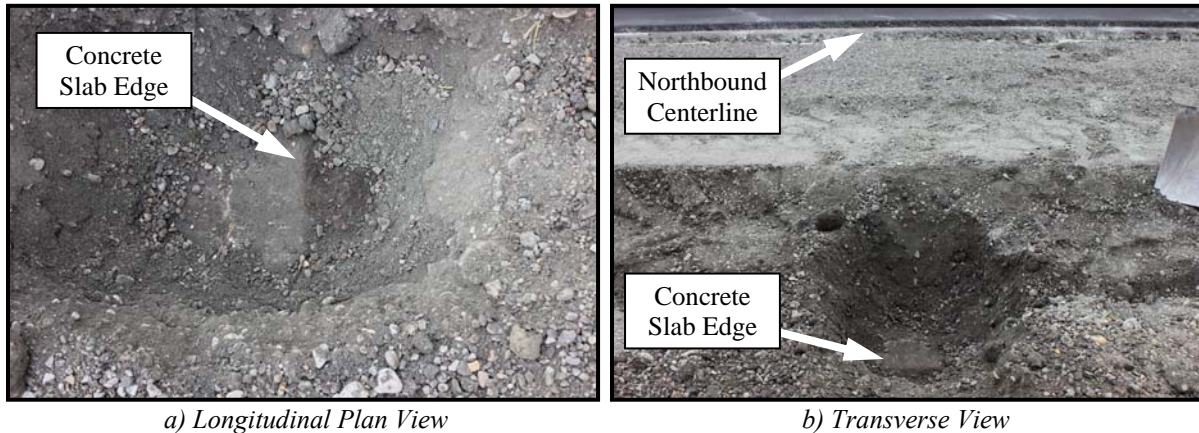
Test Pit Showing the Underlying Concrete Layer Edge
